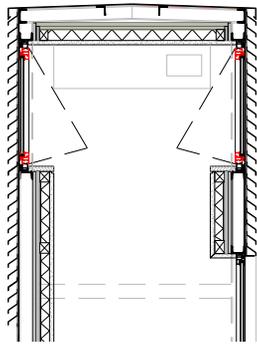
CHIMNEY WITH OUTLET TOP HUNG WINDOWS
